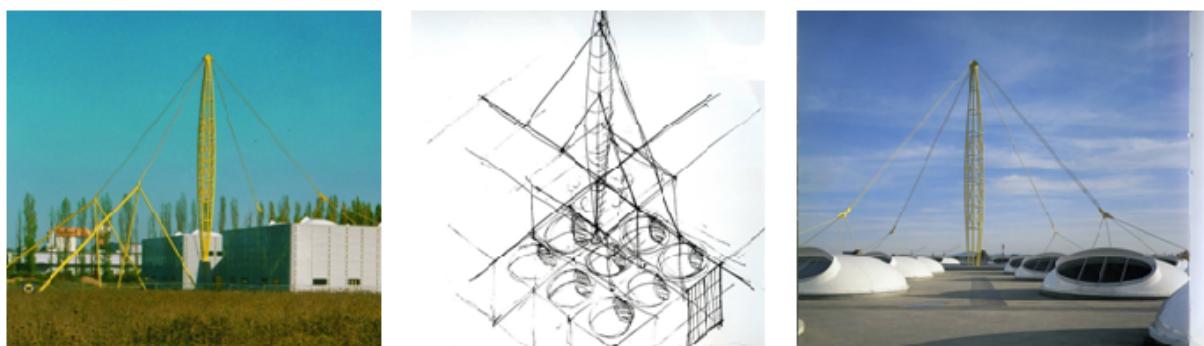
Pylon structure allows extension by halves. Conceptual sketch of the structure (Drawing by Grimshaw). Steel pylon & cables support the roof structure (Grimshaw)
